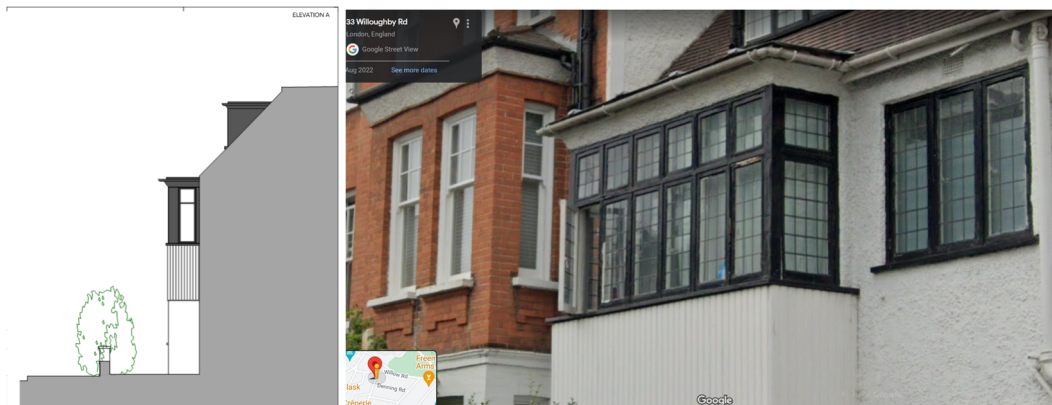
(Left) Part side elevation EL2, (Right) Google street view close up of upper bay.
